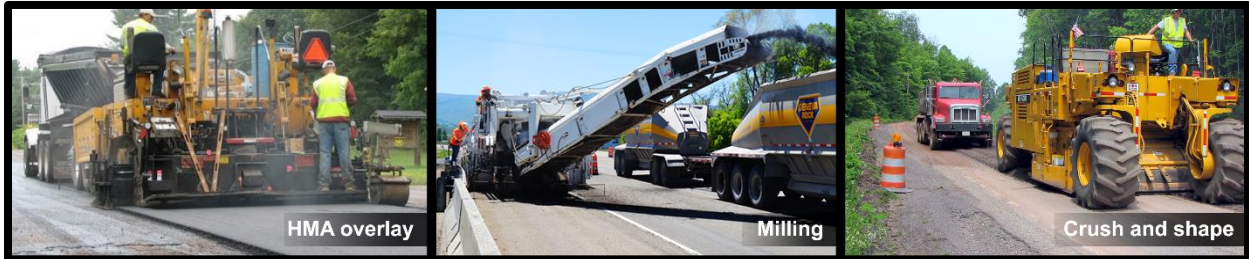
Examples of structural improvement treatments—(from left) HMA overlay on an unmilled pavement, milling asphalt pavement, and pulverization of a road during a crush-and-shape project.
